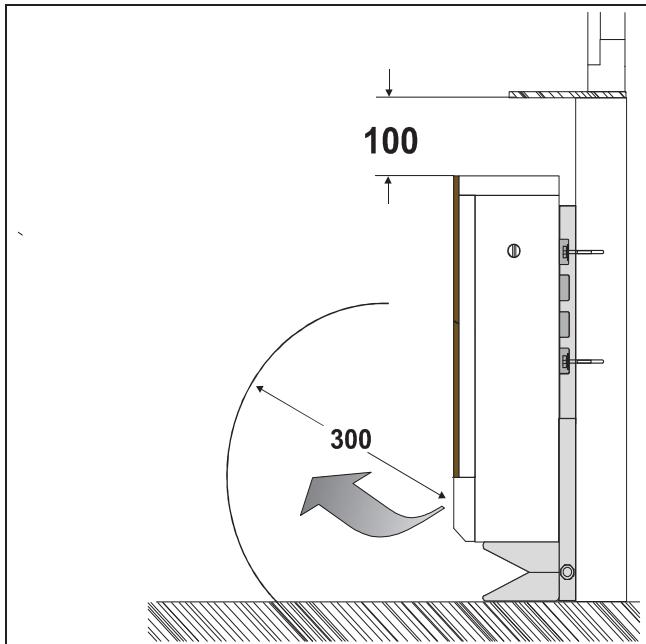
Wall/floor mounting with accessory brackets WKO18
